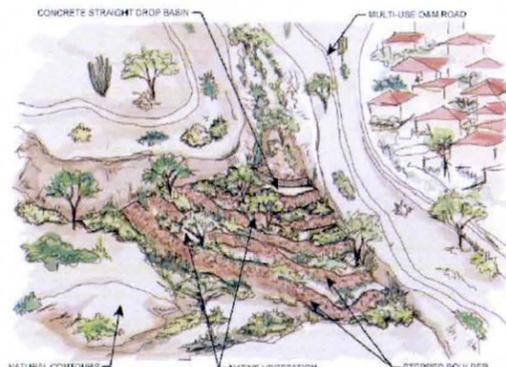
ALTERNATIVE 1B OVERALL PLAN
